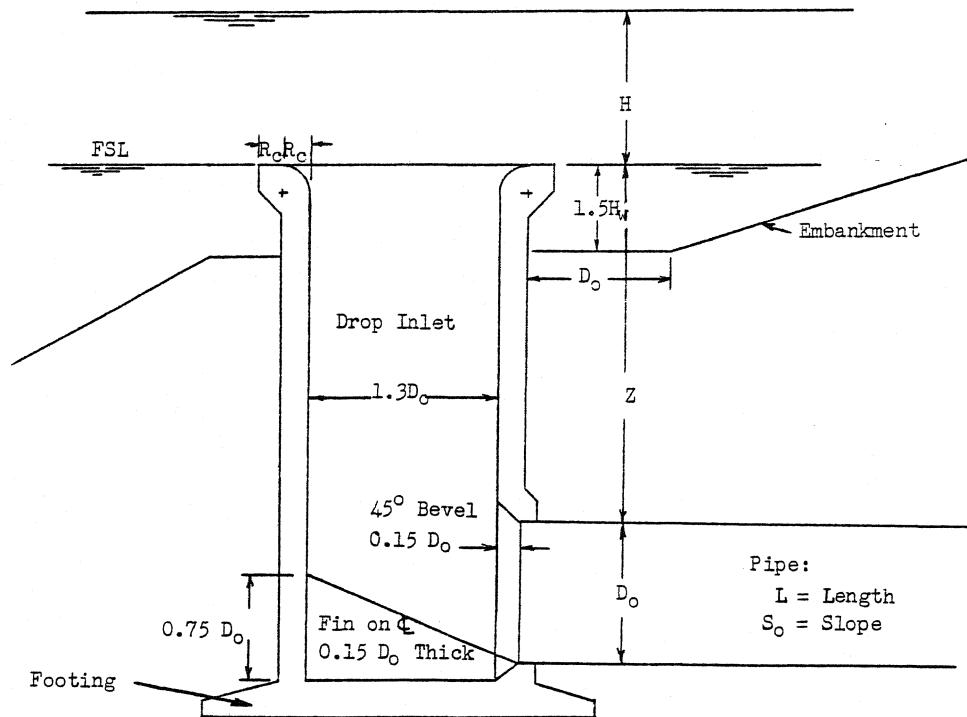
Definition Sketch of Drop Inlet Pipe Spillway
